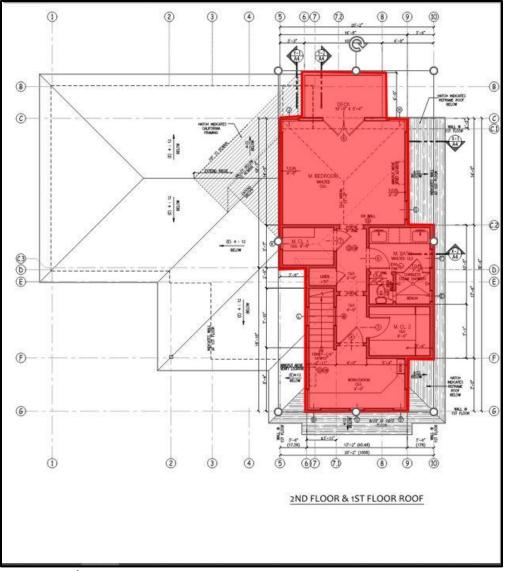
2nd story floorplan of the proposed development with additions shown in red
